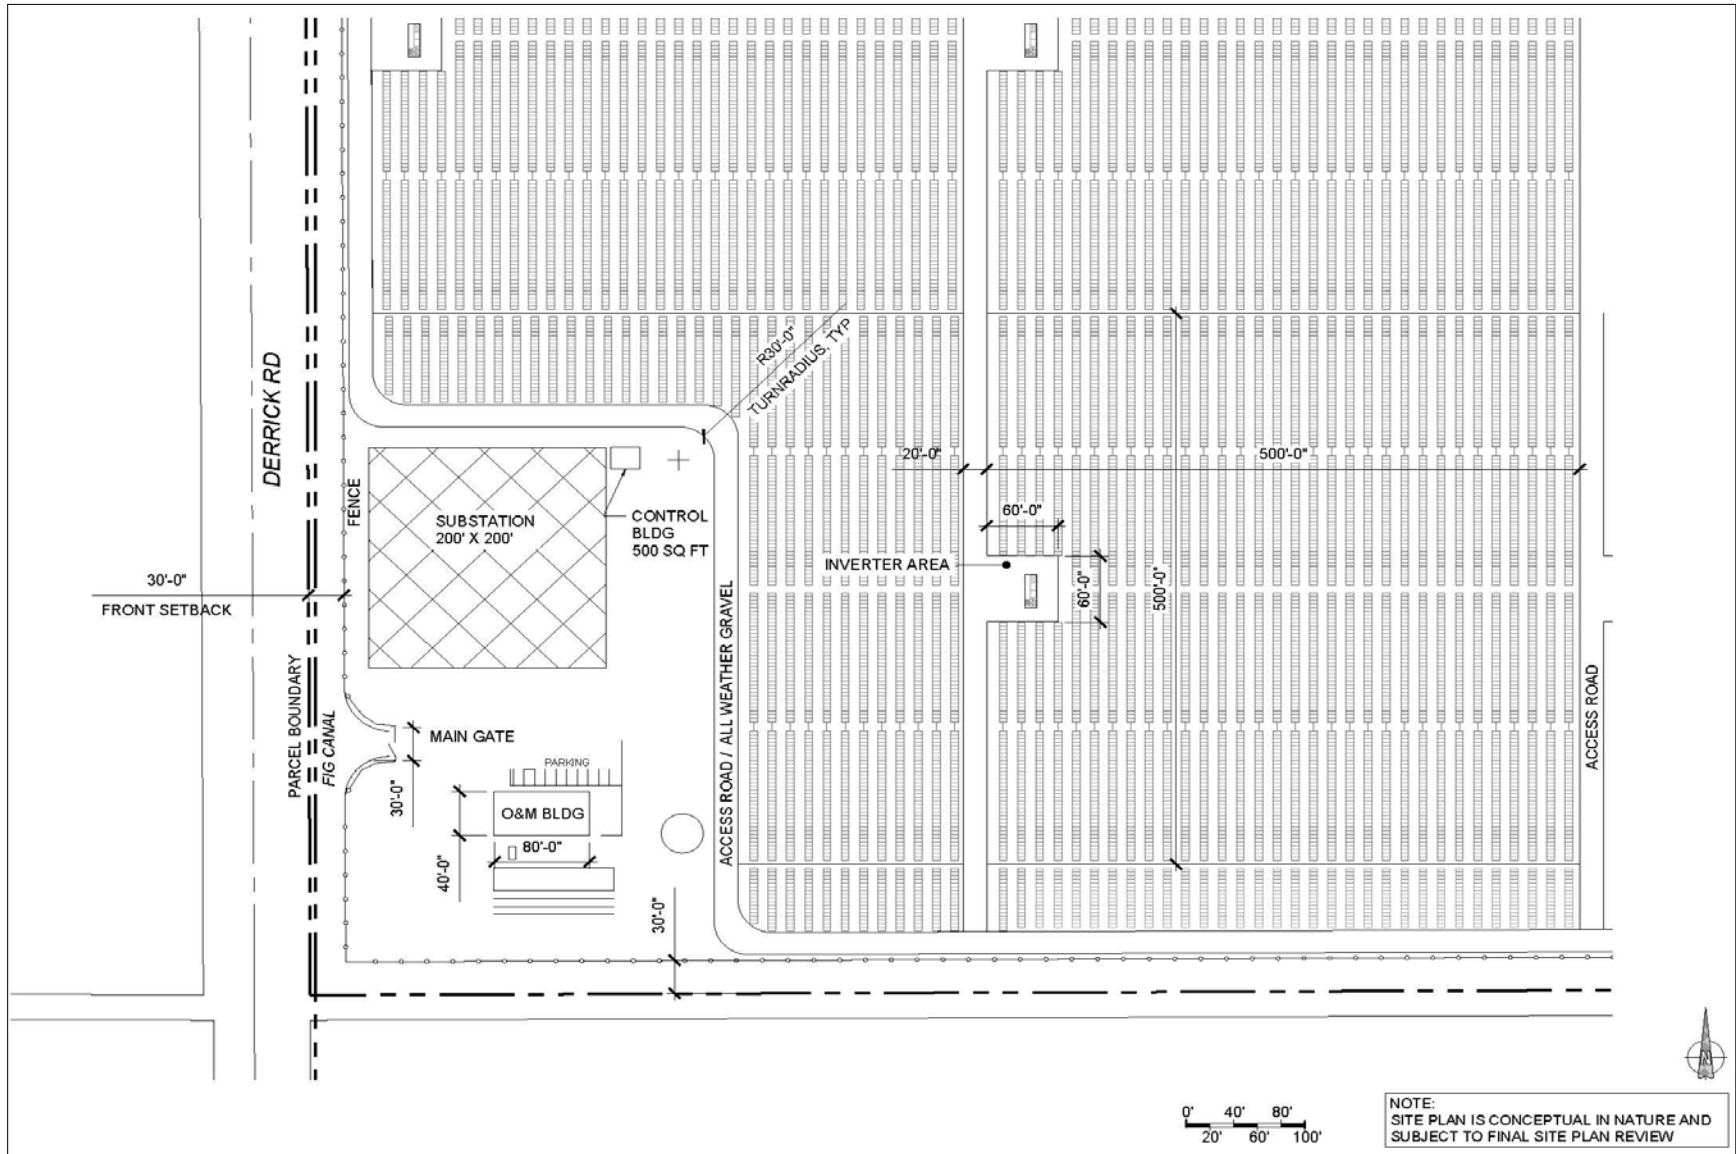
Laurel 2 Solar Farm 2 – Site Layout
